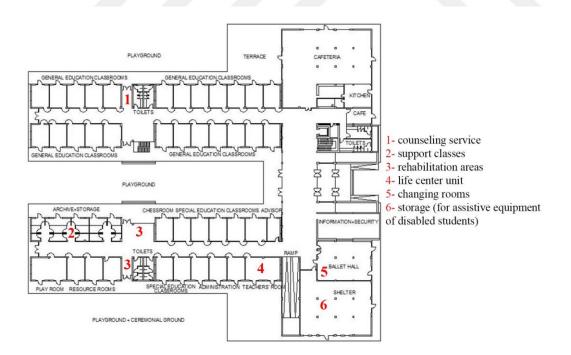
The ground floor plan of Gökkuşağı Primary School with new functional additions.
